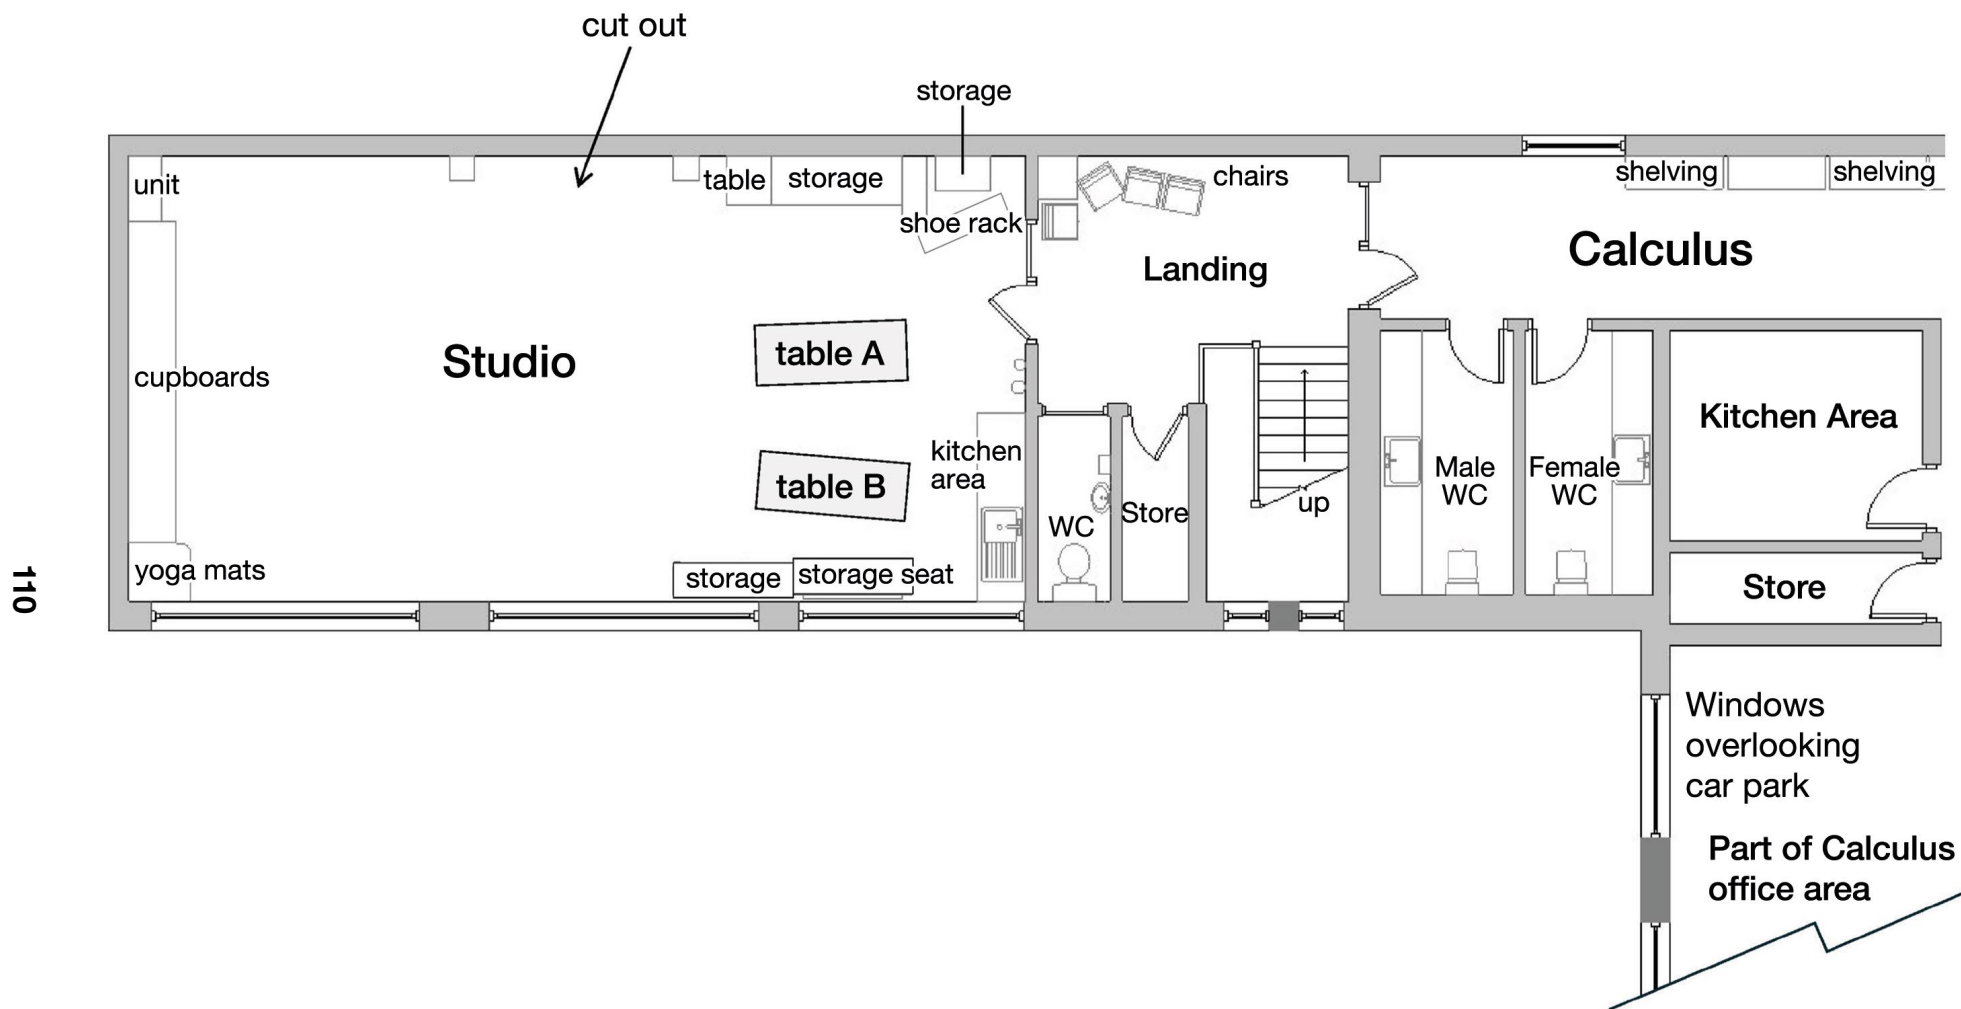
Internal plan – Hart Space downstairs and communal staircase⁸⁶
